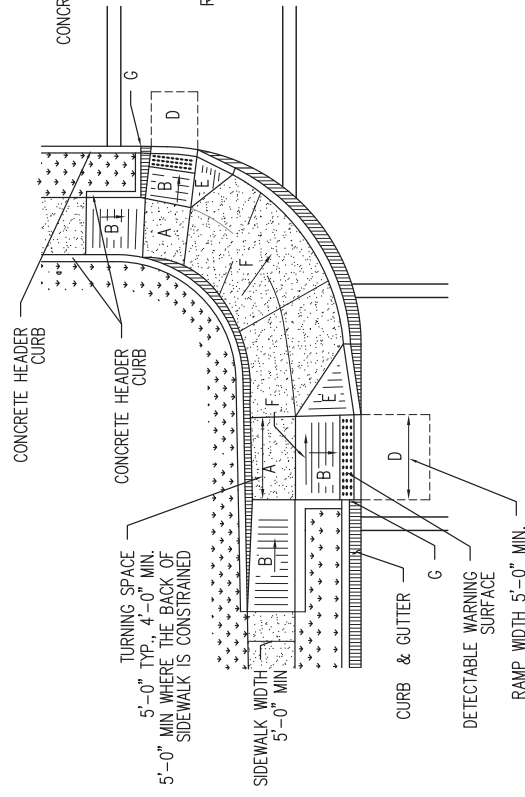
DETAIL A - COMBINATION CURB RAMP DIAGONAL
